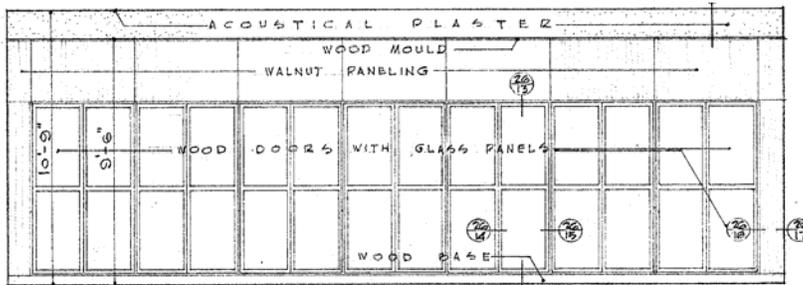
Original Construction Document, Bookcase Elevation [9]
